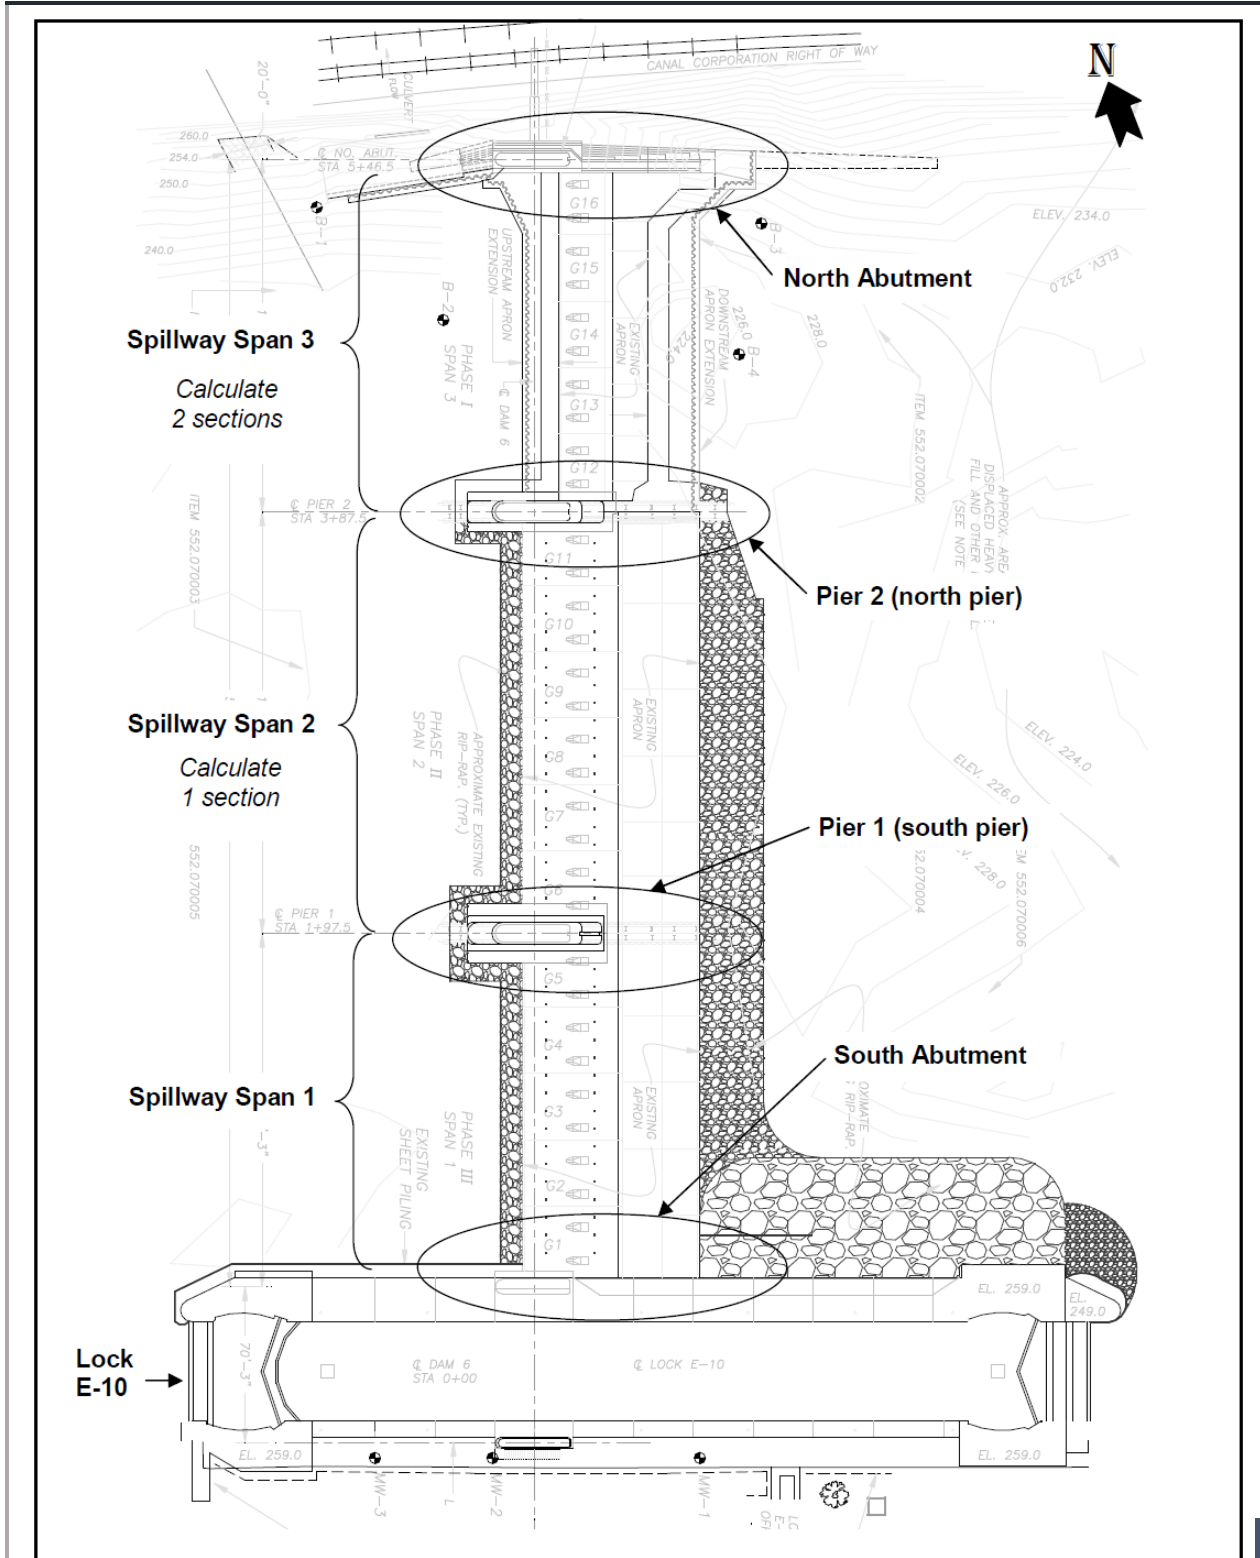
B – Plan of Movable Dam 6 at Lock E-10
